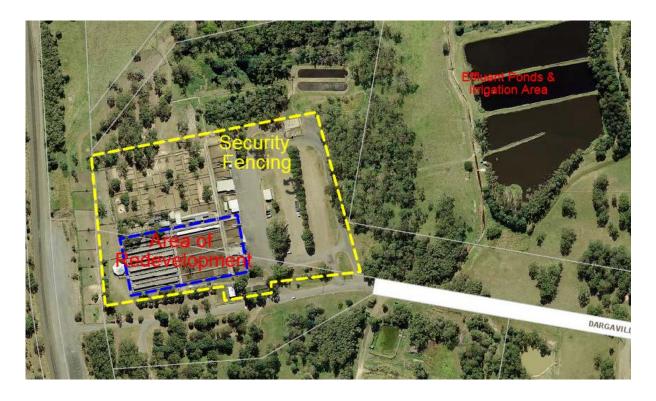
Area of proposed Redevelopment and proposed Security Fencing
